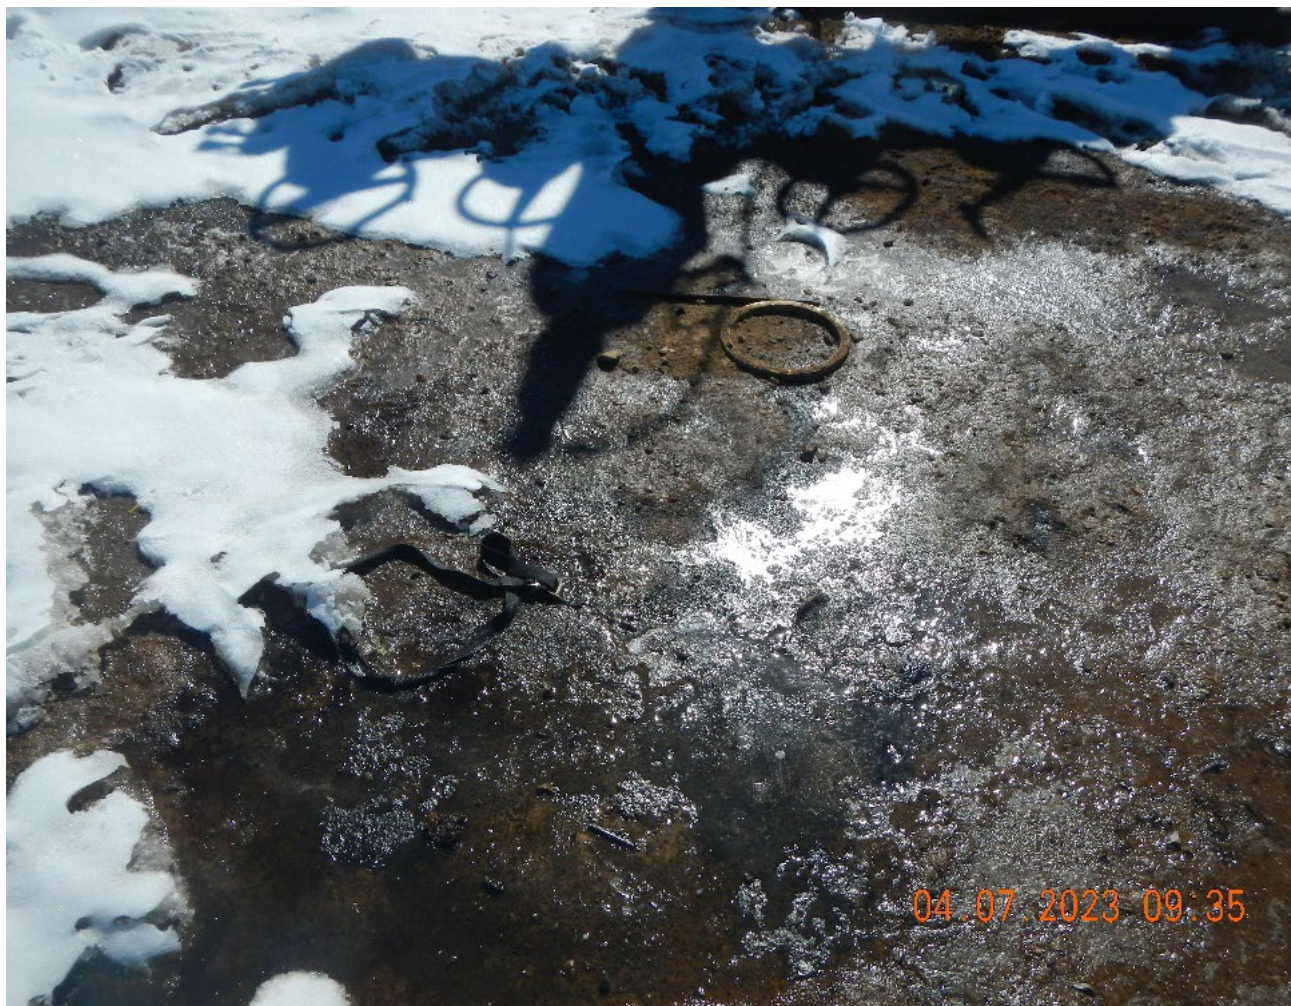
Recent drilled wells center left of photo. Looking ~southeast
